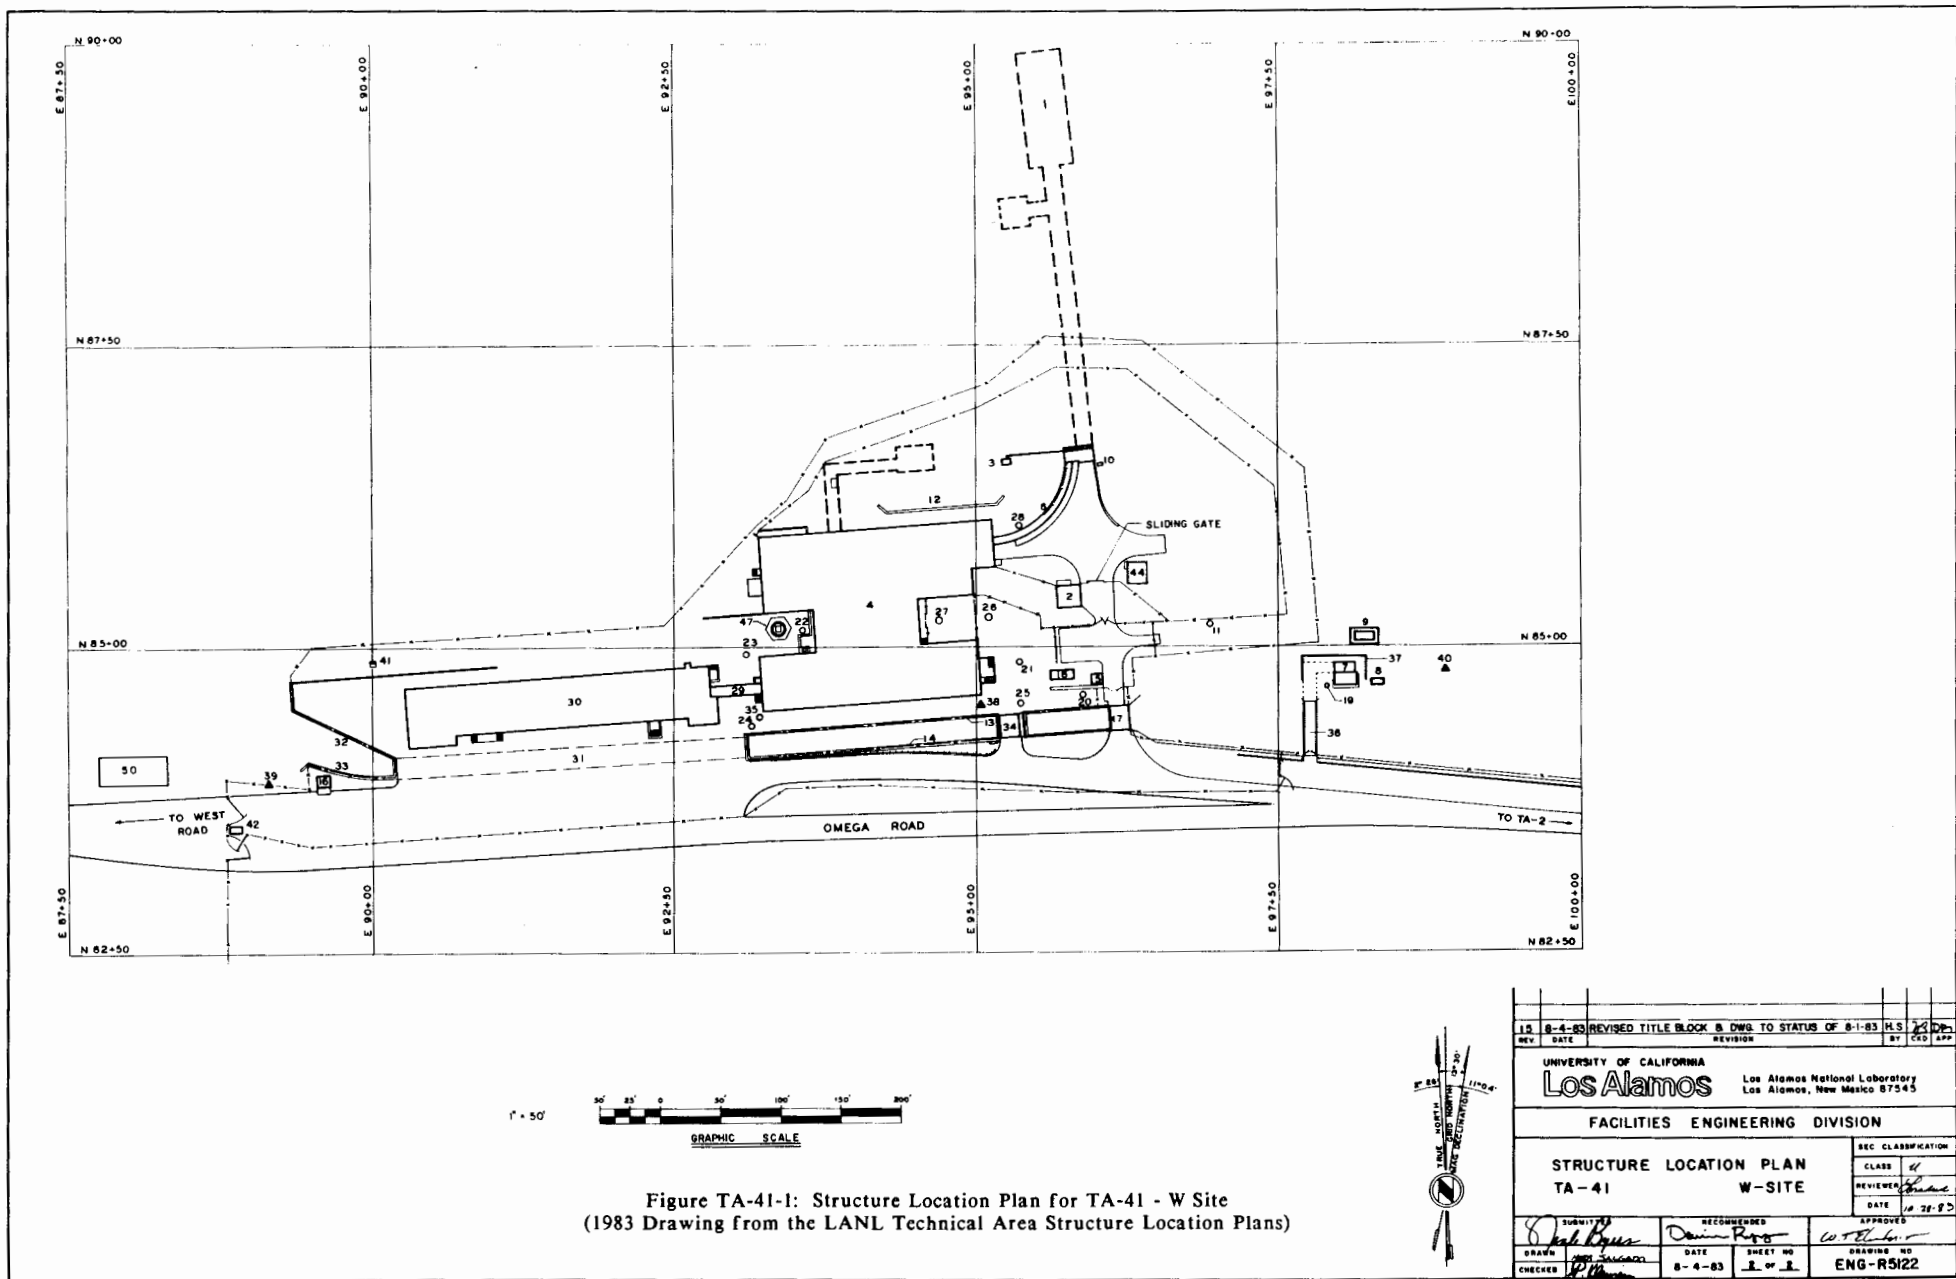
Structure Location Plan for TA-41 - W Site
